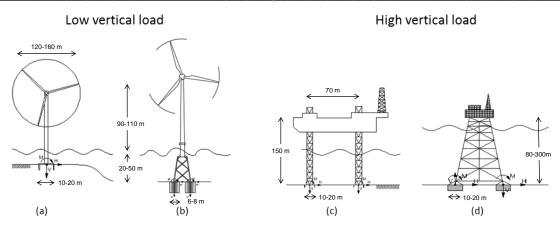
Offshore energy infrastructure supported by skirted foundations as a) monopod, b and d) jacket with multiple foundations, c) jack-up with typically three foundation.
